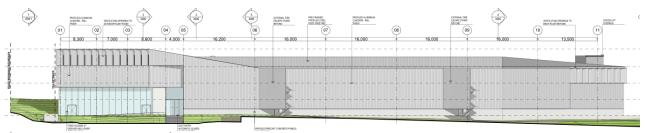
Proposed east elevation Source: Lahznimmo Architects
